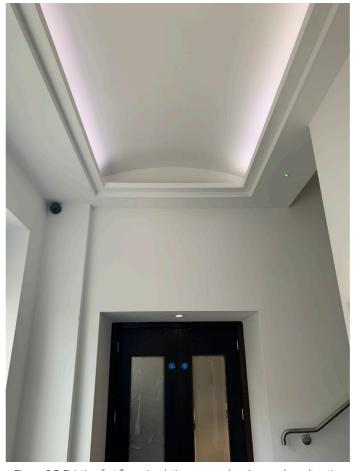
Existing first floor circulation space, showing modern alterations to ceilings and modern door insertions
